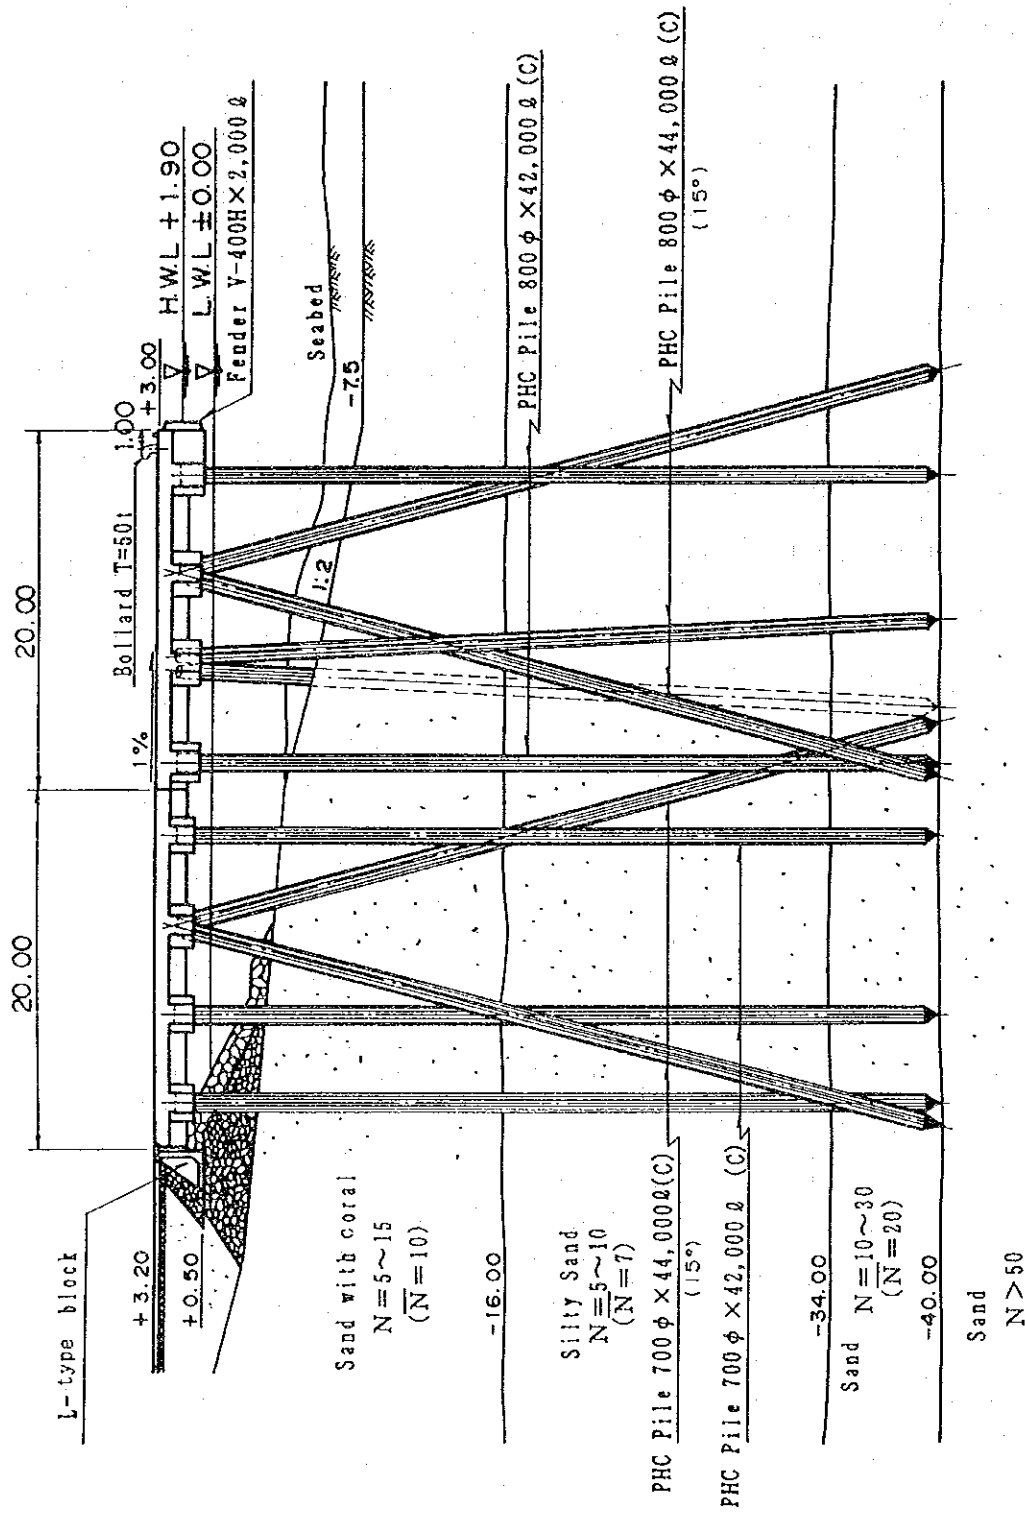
Standard Cross Section of Main Pier of Specialized Container Berth
